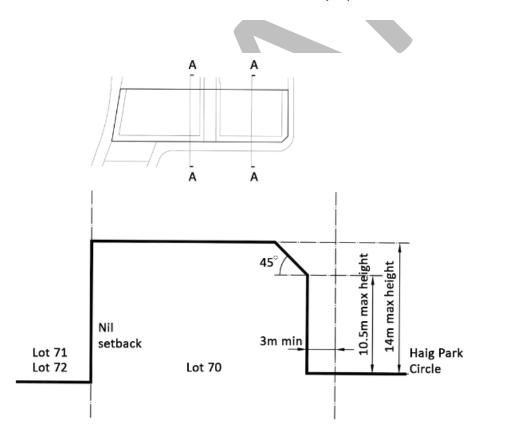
Section AA - North south section of building envelopes through eastern and western buildings.
